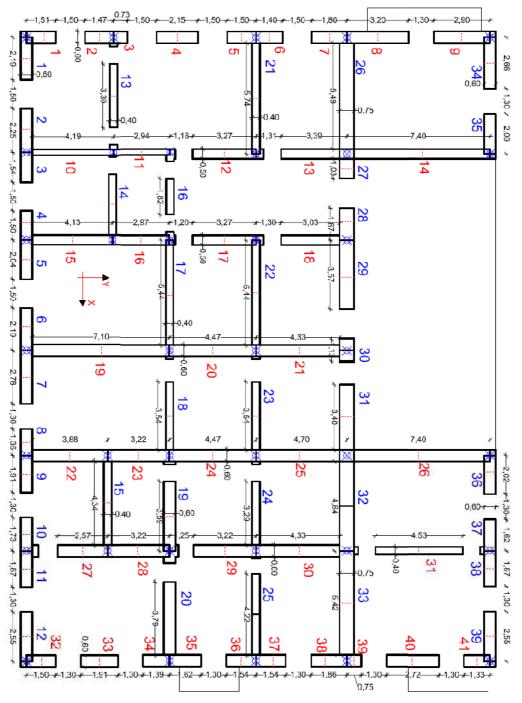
Structural plan BT"A". First Floor (+8.35).
